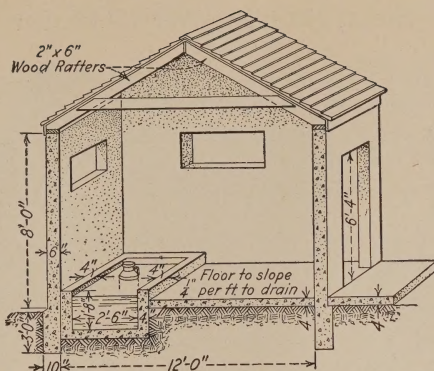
A small milk house measuring 10 feet by 12 feet provided with concrete foundation, floors, walls and cooling tank.
